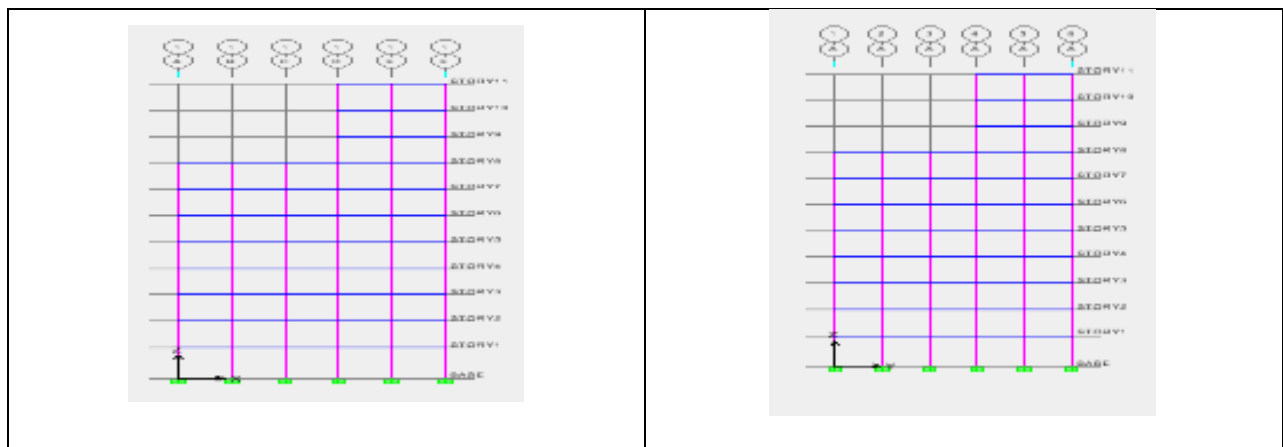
Elevation of Asymmetric building Model-4 along longitudinal and transverse direction
